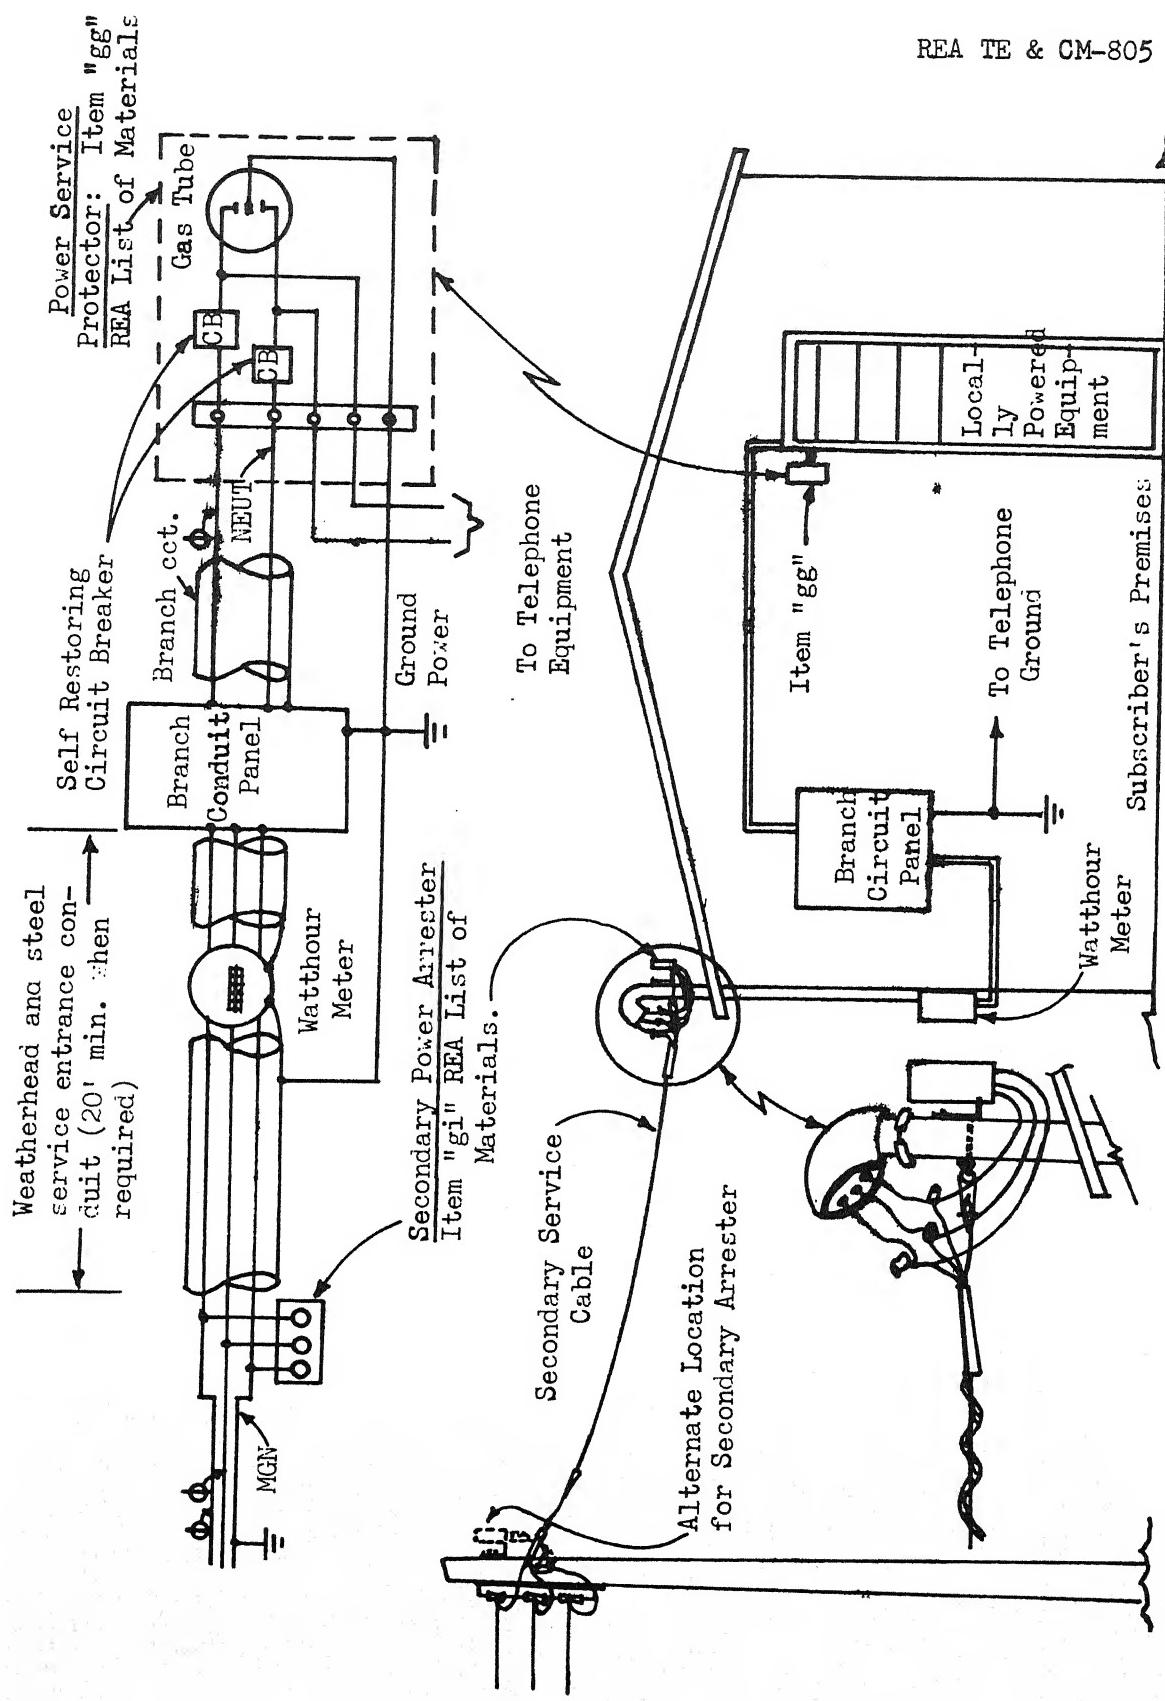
TYPICAL INSTALLATION OF SECONDARY ARRESTOR AND BRANCH CONDUIT POWER SERVICE PROTECTOR
